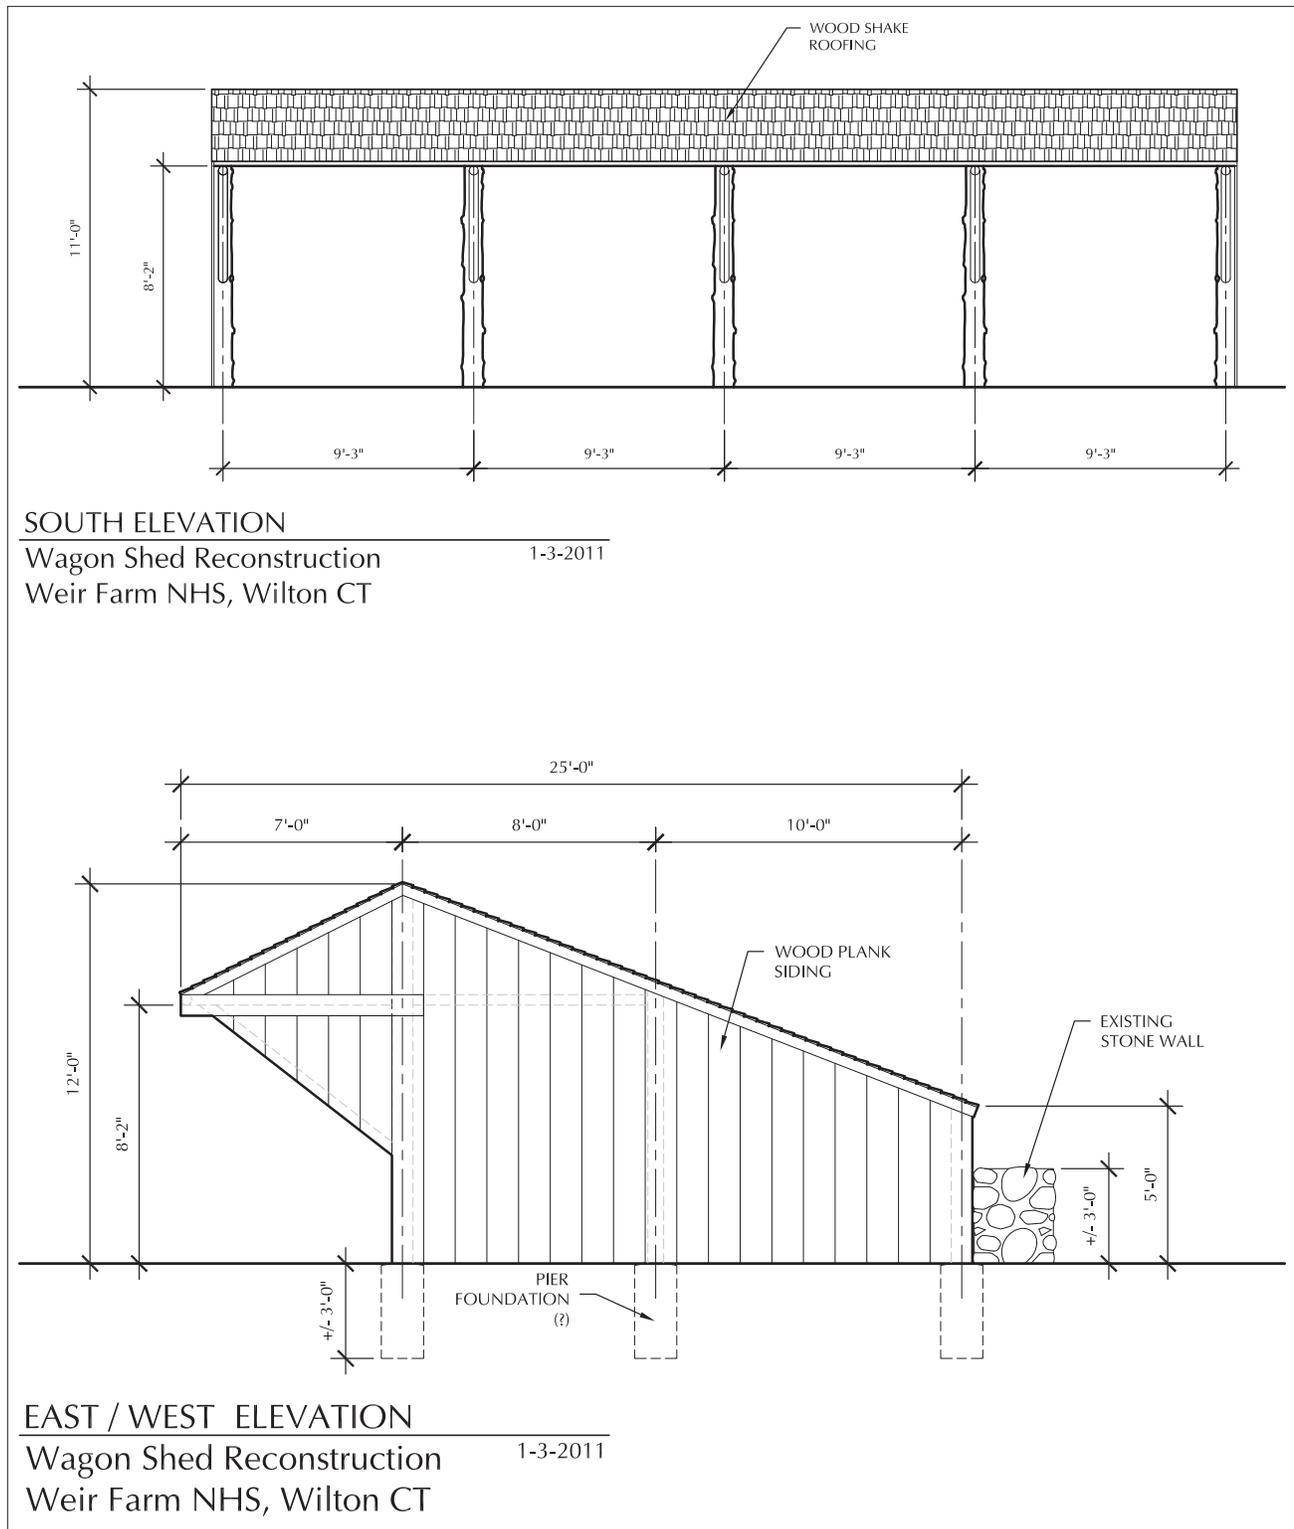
Elevations for the Wagon Shed reconstruction. In conjunction with the plan, the Historic Preservation Training Center prepared elevations based archeological and photographic documentation for reconstructing the Wagon Shed, 2011 (HPTC).
